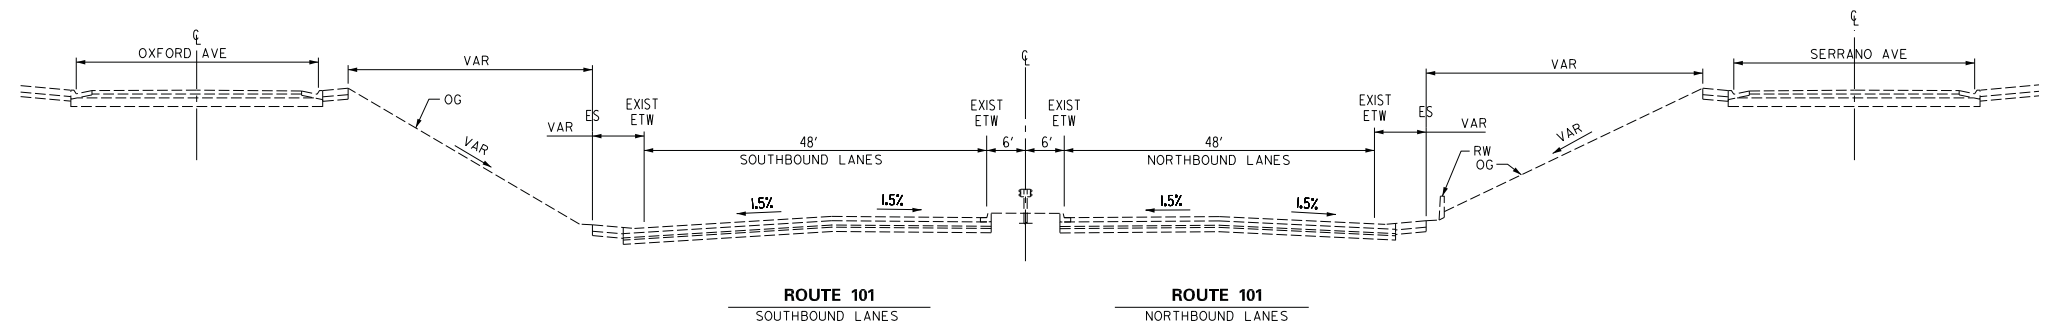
Existing Freeway Typical Section Between Santa Monica Boulevard and Virginia Avenue
